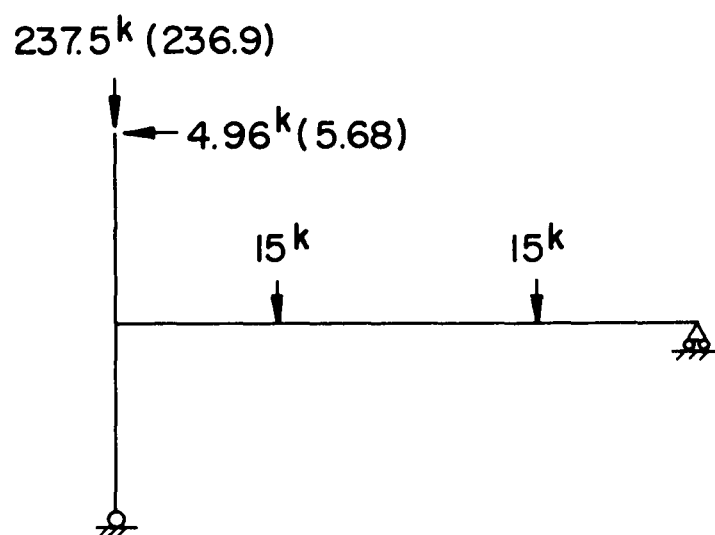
LOADS ON TEST SPECIMEN RC-1
